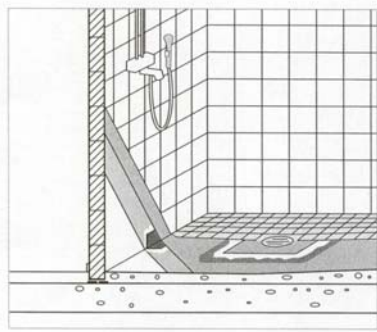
Wet areas should be made with stone structures and there must be reliable waterproofing in their floor and walls.
